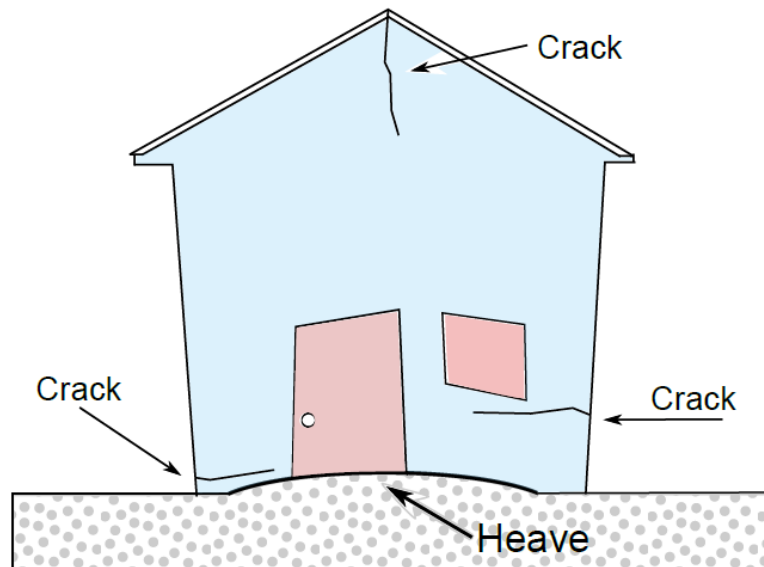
Illustration of damaged buildings constructed on expansive clays
